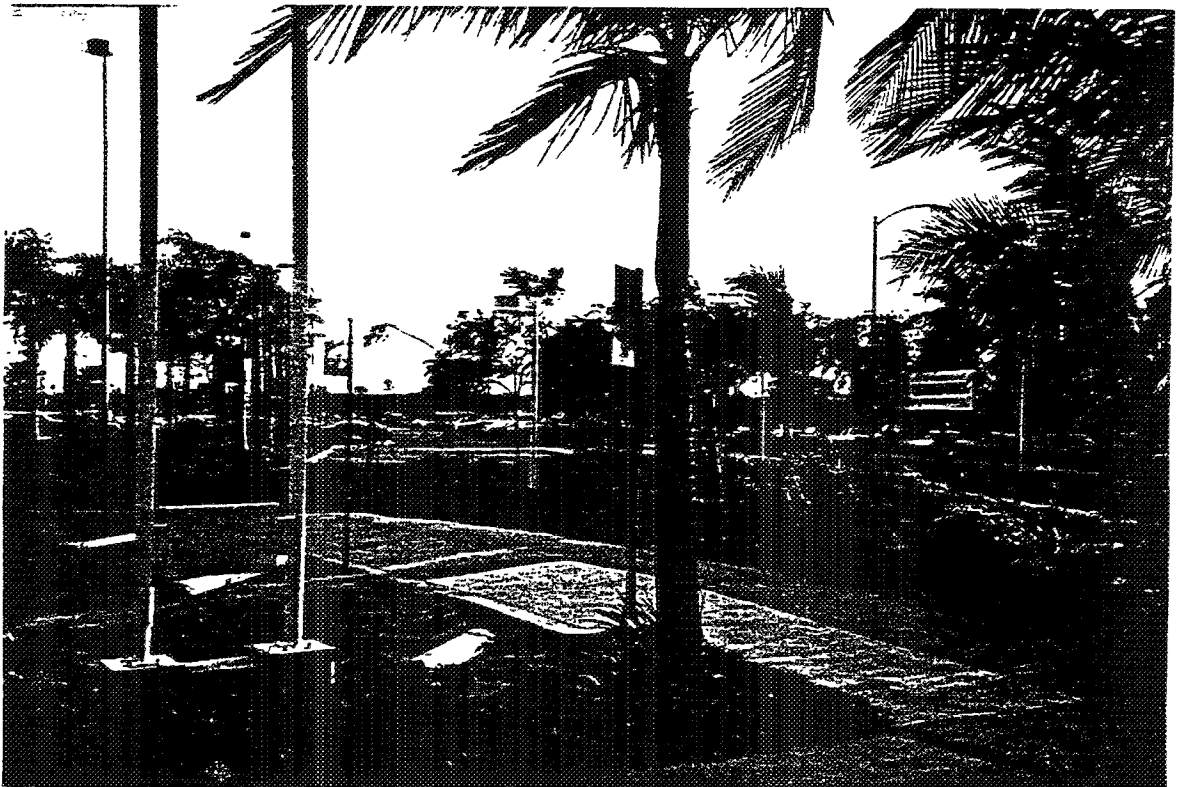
Willow station: A Park and Ride facility is adjacent to the west edge of the platform. A trailer park is located to the west of the Park and Ride facility.
